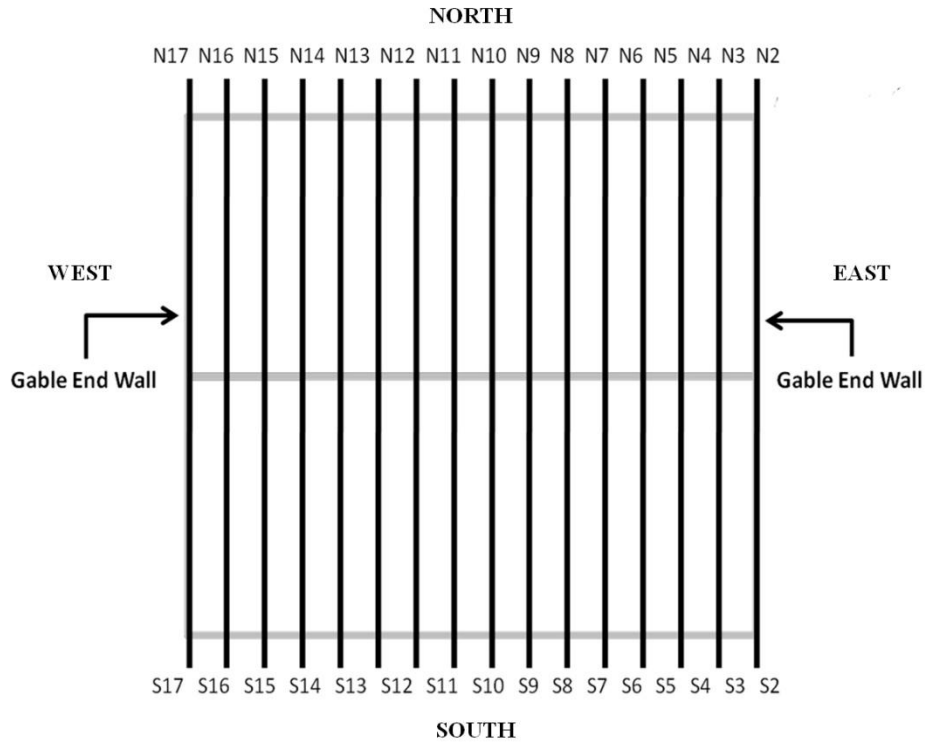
Truss layout and naming conventions, with laboratory cardinal directions
